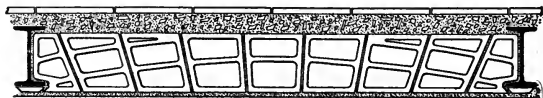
Side-construction Terra-cotta Arch. Radial Joints.
